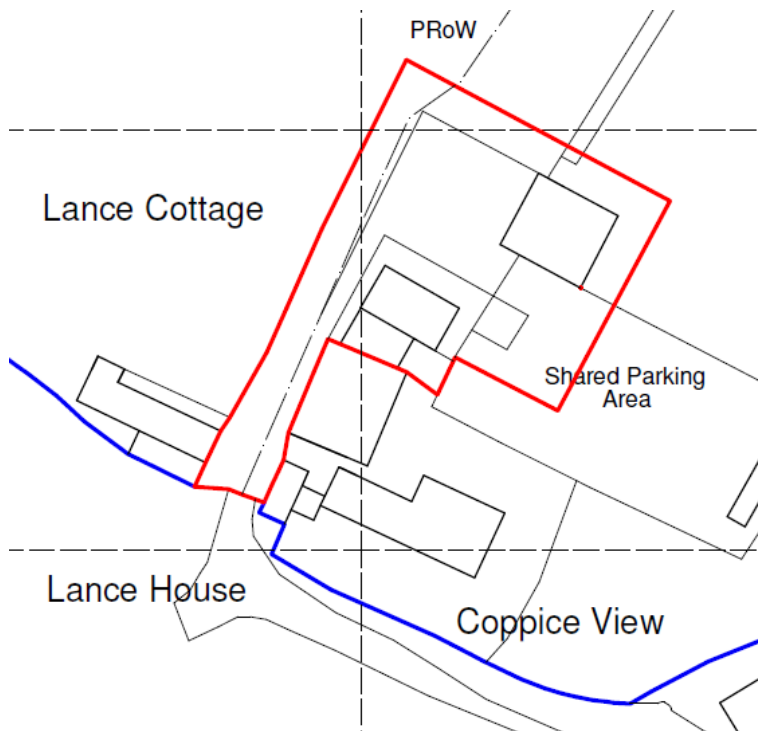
The application site in its immediate context – Site Plan (drg: B12244 02)
